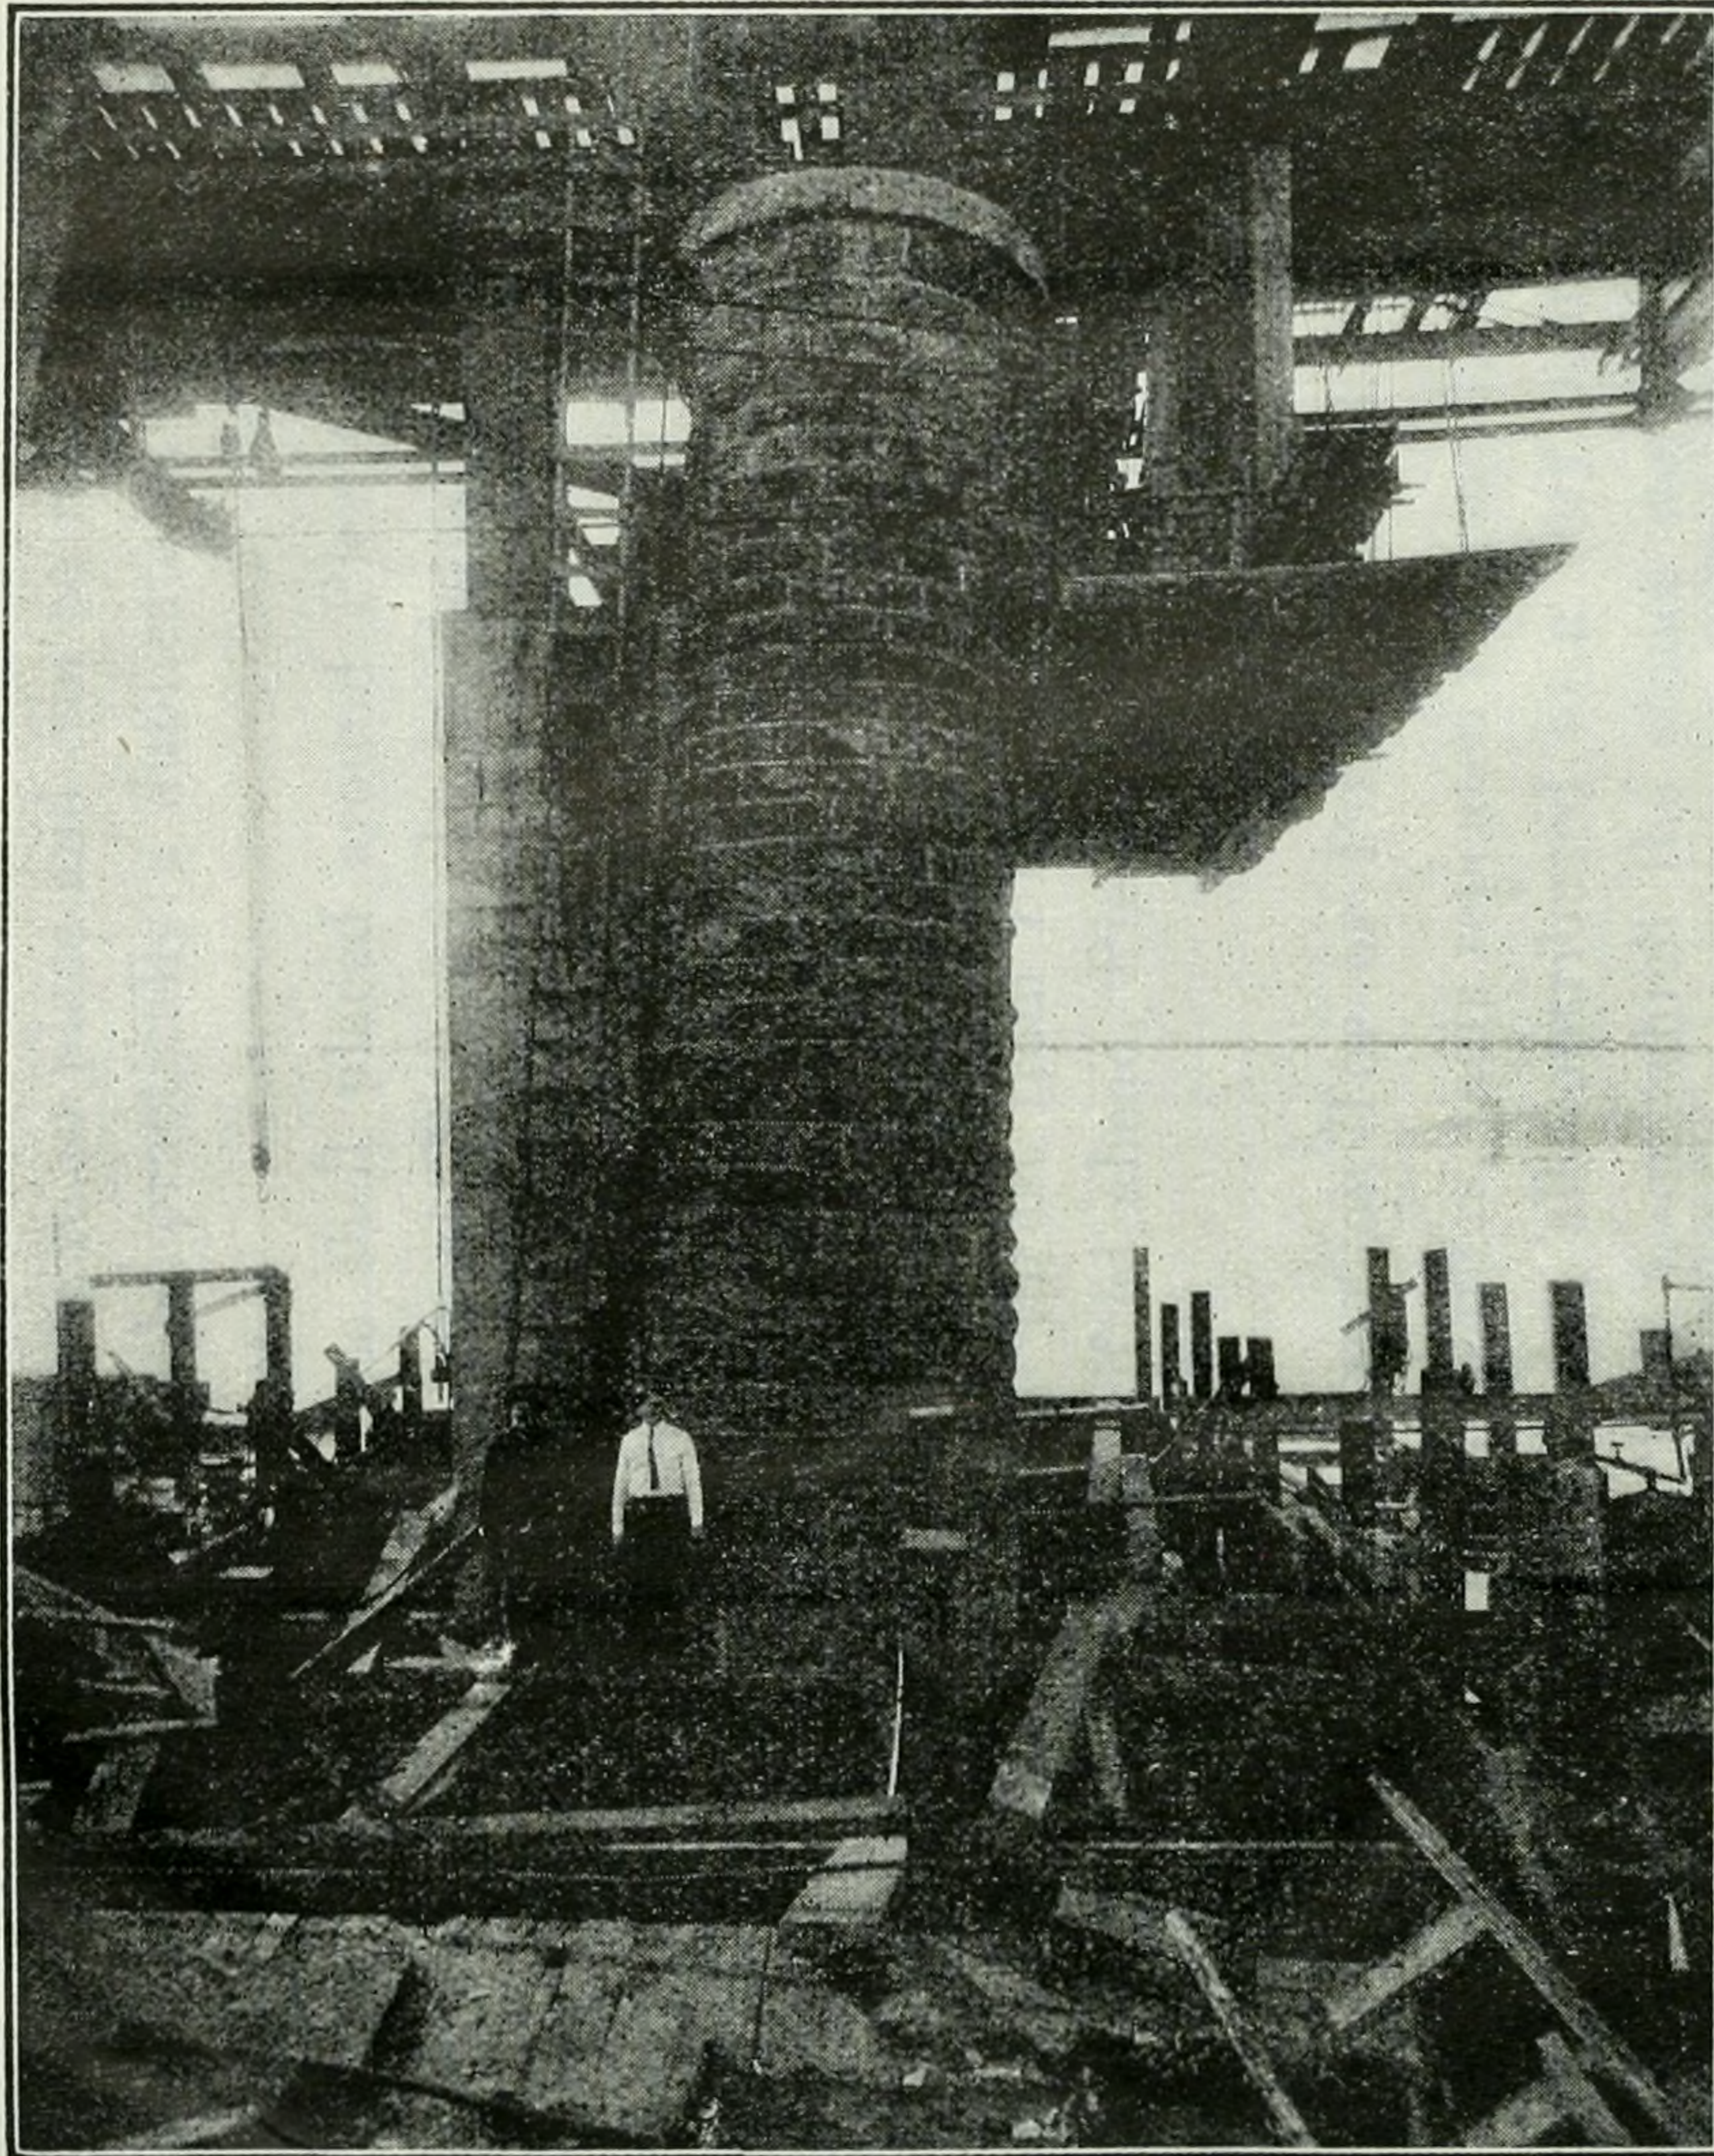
END VIEW OF PIER 4 DURING RECONSTRUCTION.
